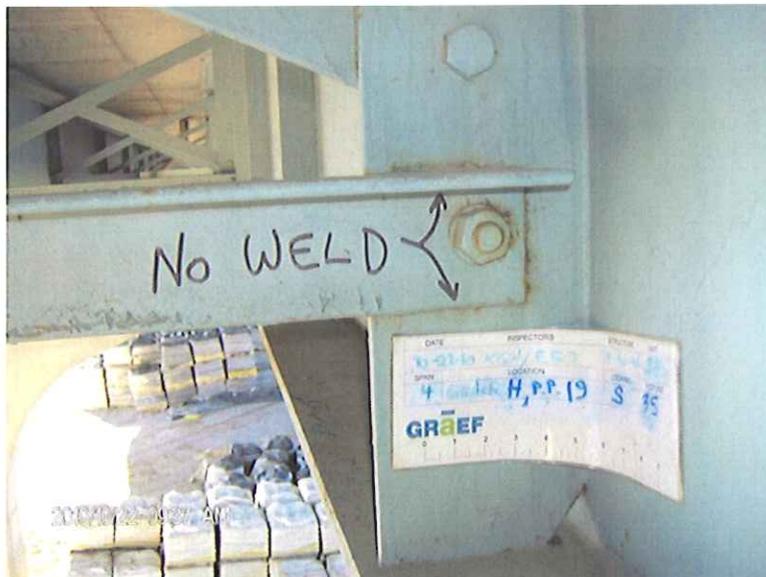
Missing weld at cross-frame bottom chord to connection plate
